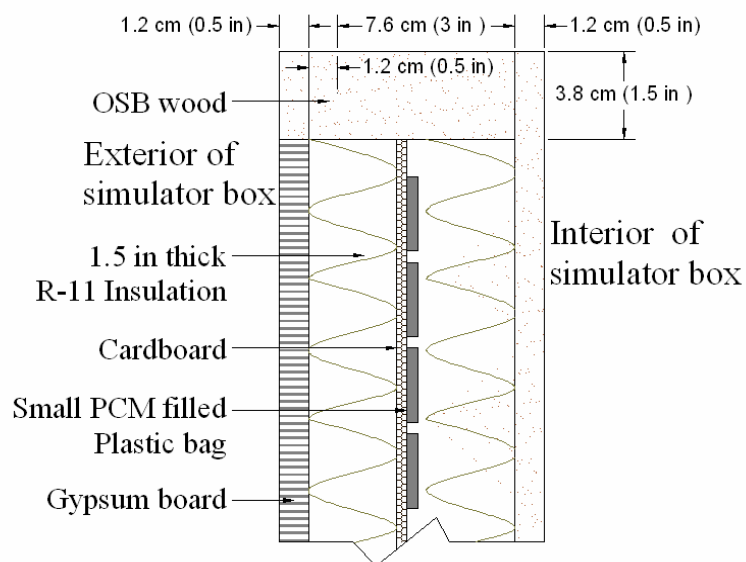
PCM arrangement inside the wall cavity for the second series of tests.
